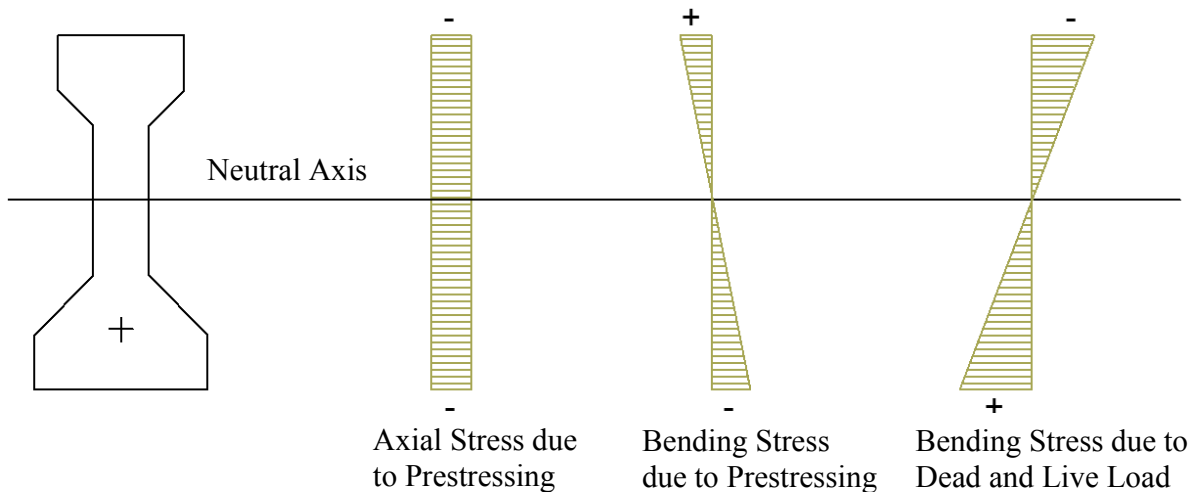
Stresses Applied to Girder Cross Section (Un-Damaged Girder)
